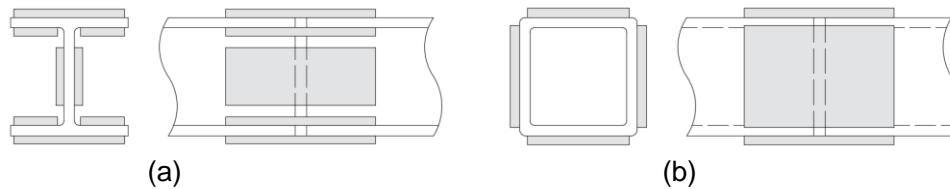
Splice connection formed by bolted or/and bonded lap plates: (a) for I-section FRP members; (b) for tubular section FRP members.
